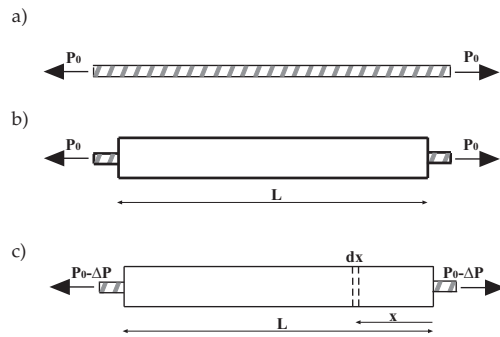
Manufacturing process of the prestressed concrete prism: a) alone prestressed wire, b) wire with cast concrete before prestressing force release, c) prestressing force release.
